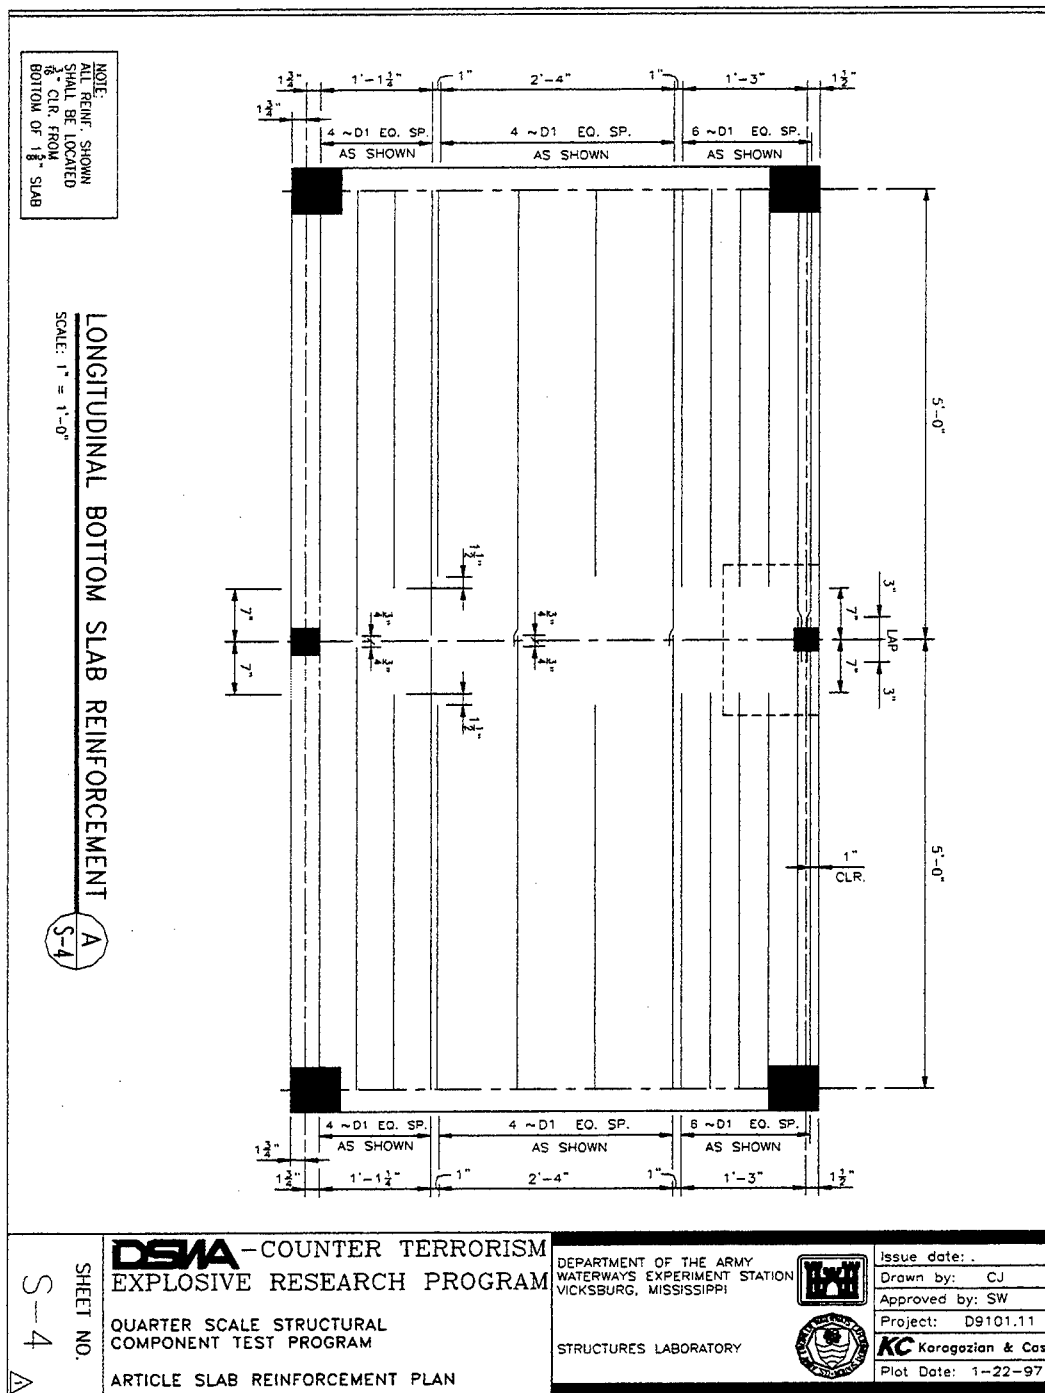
Slab Reinforcement Details, Bottom Longitudinal
